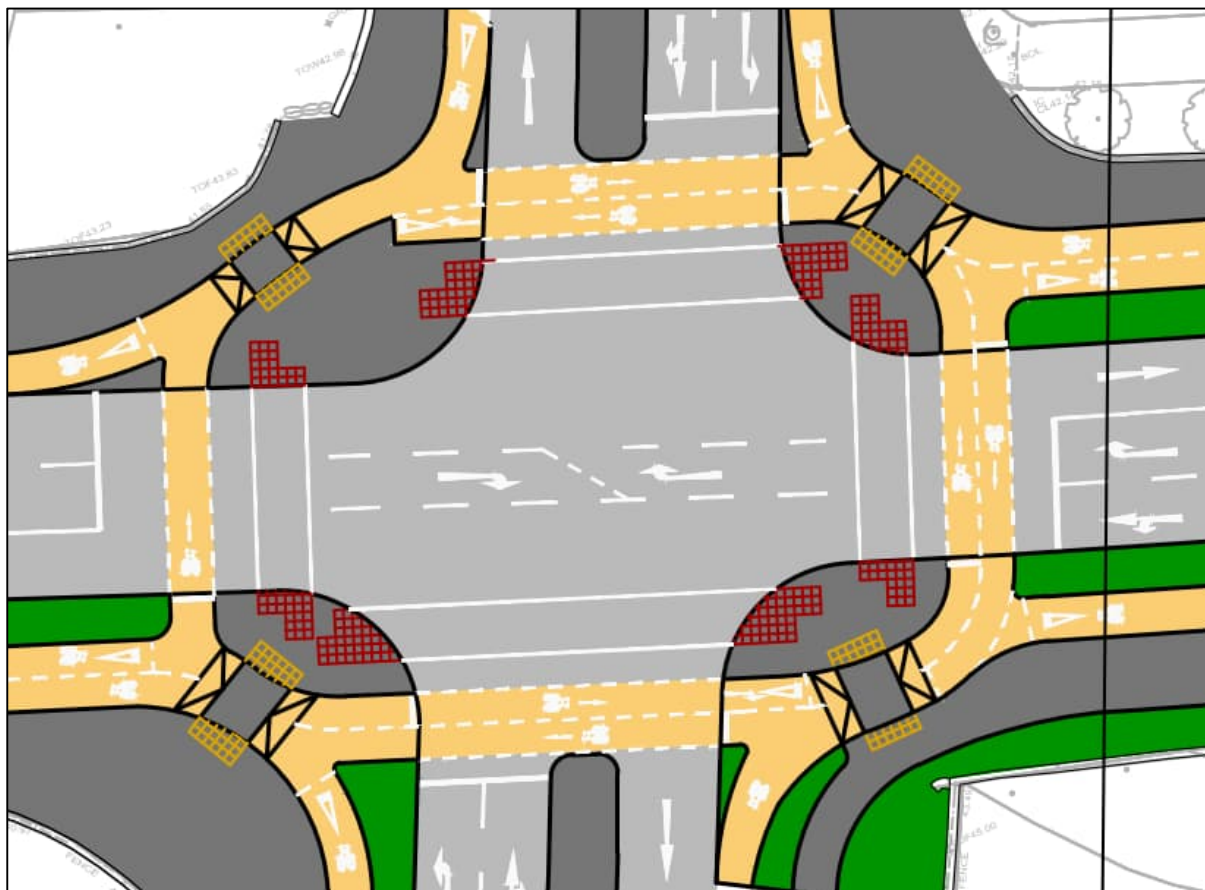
Proposed Tactile Paving Detail at Signalised Junctions
